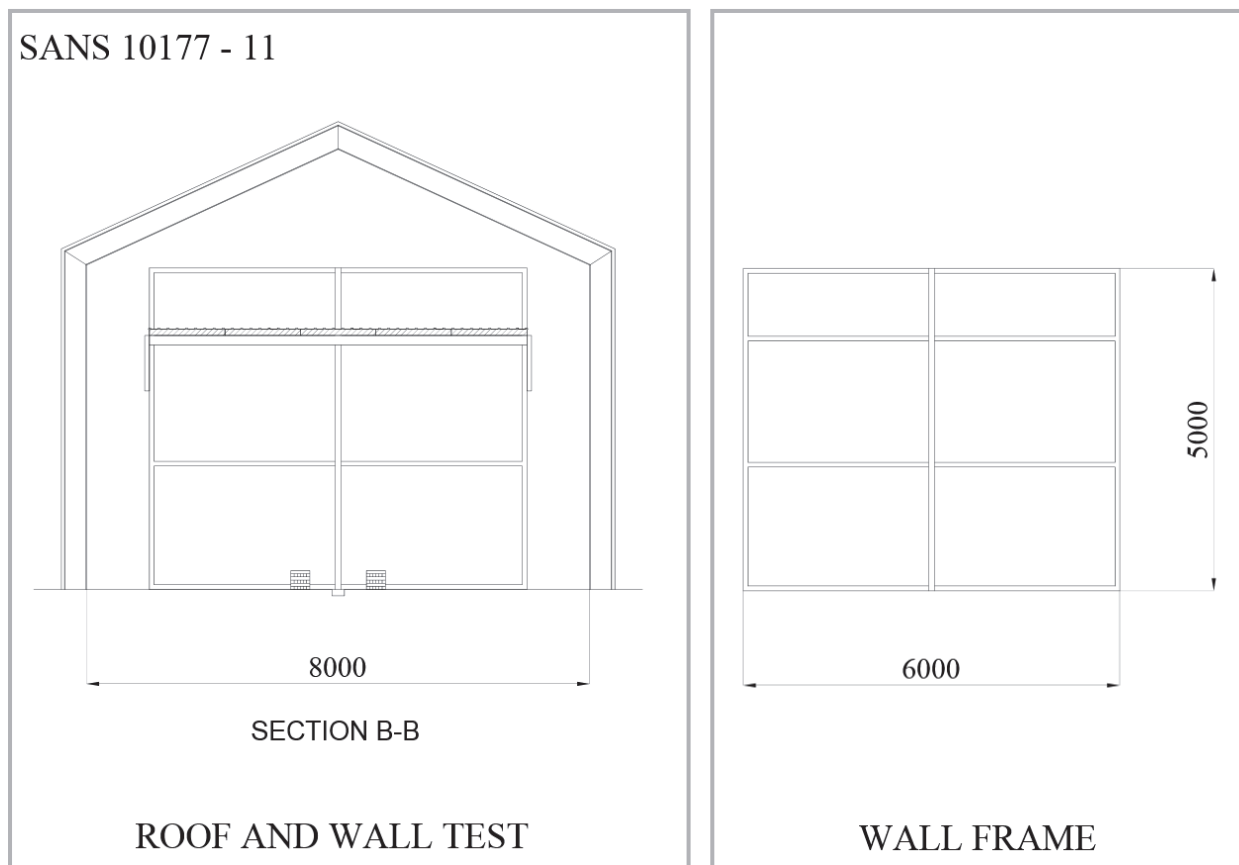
Typical side-cladding installation in SANS 10177-11 facility
